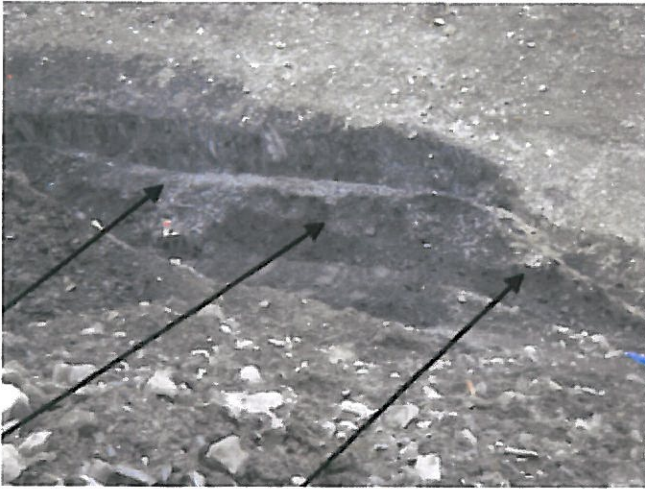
TRENCH WILL KEY-IN 100 MM HDPE LINER
